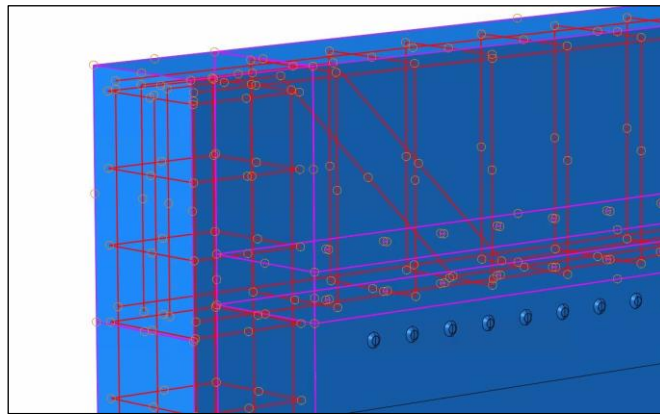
Refined modelling approach – “Embedded region” constraint between concrete and the steel reinforcements
